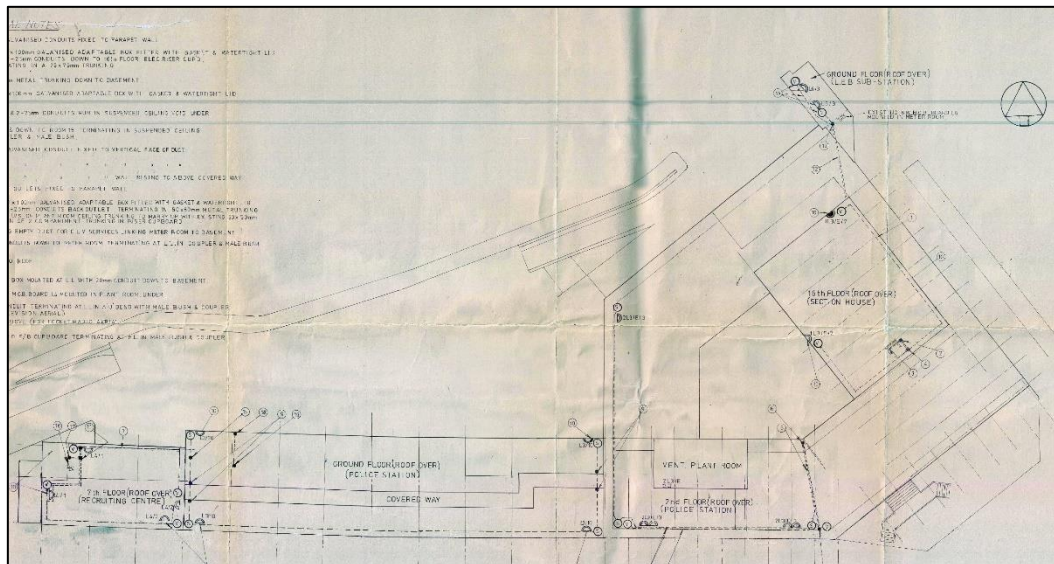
A 1979 roof plan showing the ranges of the building (Chief Engineer's Office, Metropolitan Police)
